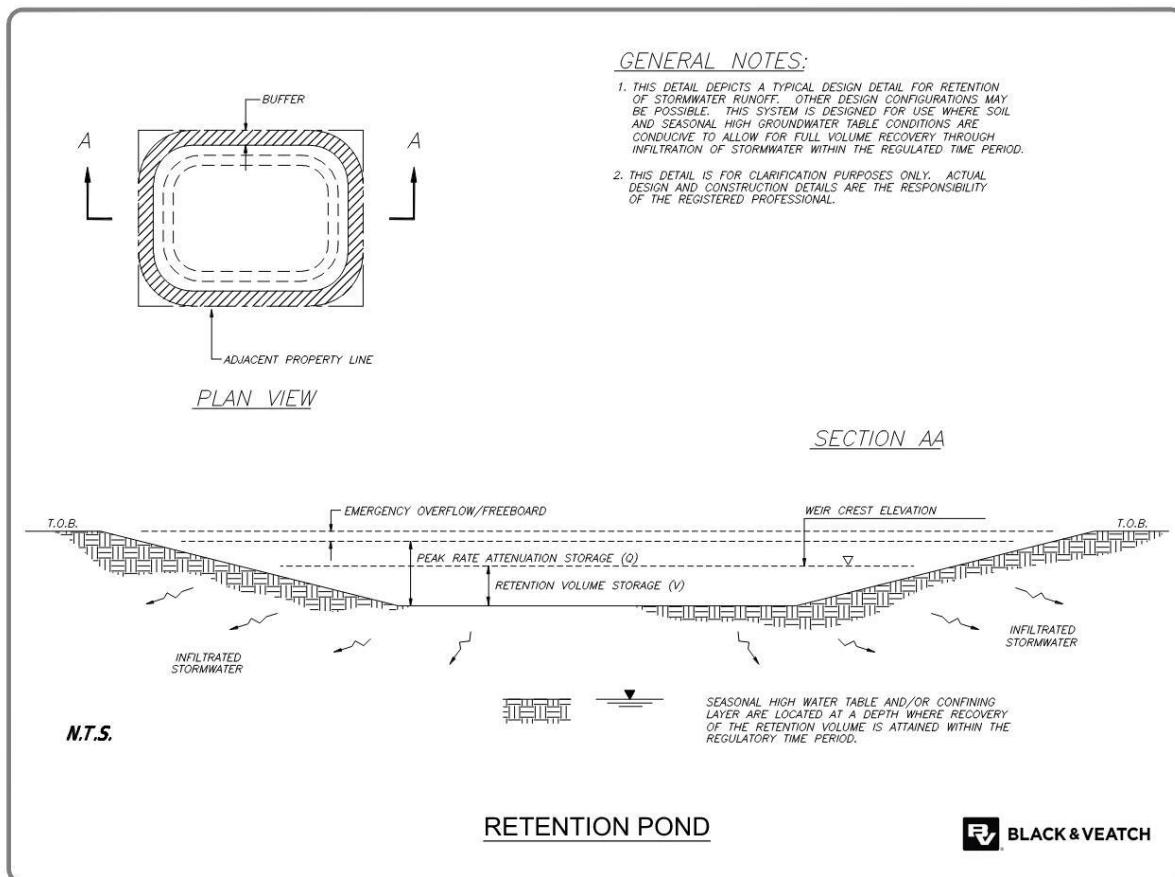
Standard Detail Depicting a Typical Retention Pond Design
